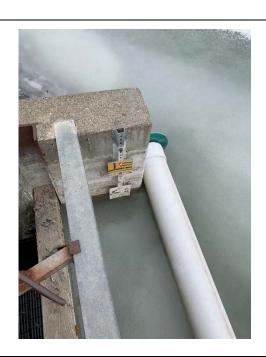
2019 Gauge located at ash pound outlet structure (AP-1)
